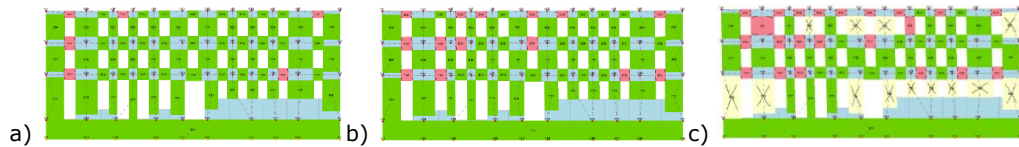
In-plane failure mechanism for Elite's Palace, for transversal; seismic direction: a) appearance of first damage; b) maximum shear force; c) top horizontal displacement; [252]
